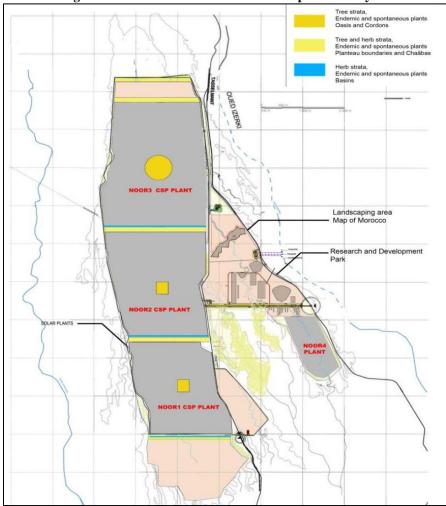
The Noor-Ouarzazate Complex Site Layout
